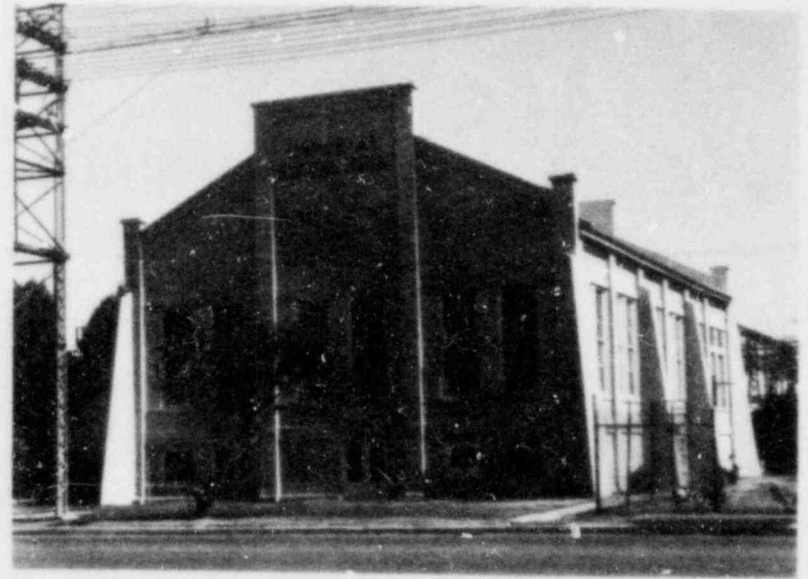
EL CENTRO TERMINAL SUBSTATION BUILDING
